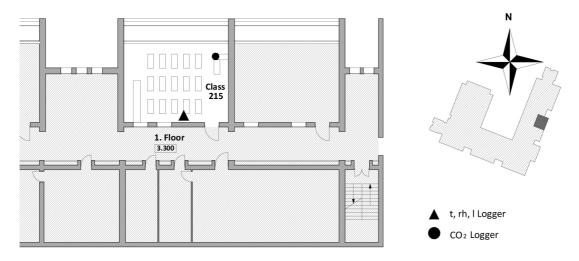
Locations of the sensors in Classroom 215 on the plan. Source: Own
